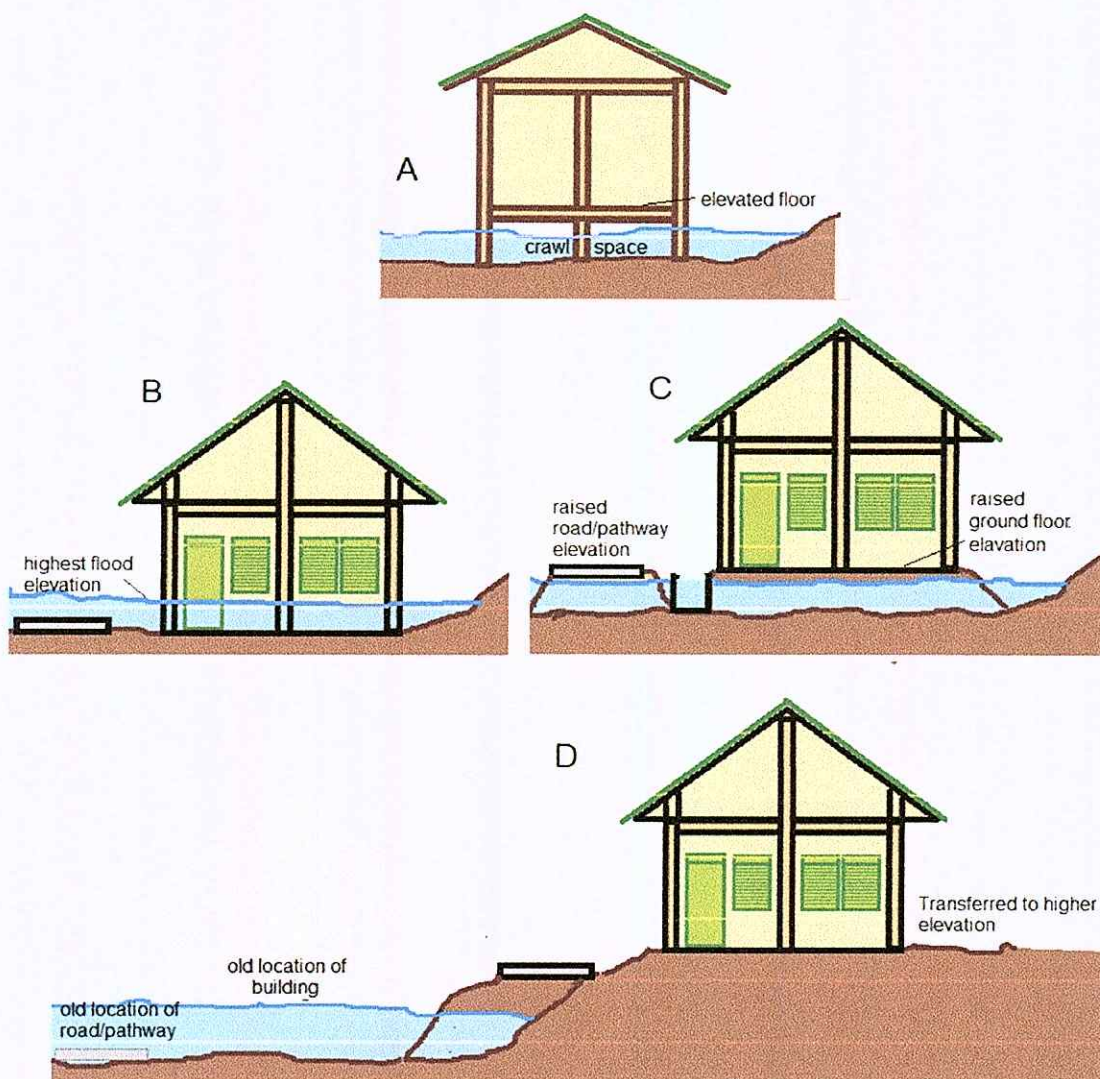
A) School building with crawl space; B) Flooded school building; C) Raised ground level of building and road; D) Transferred building to higher elevation.
